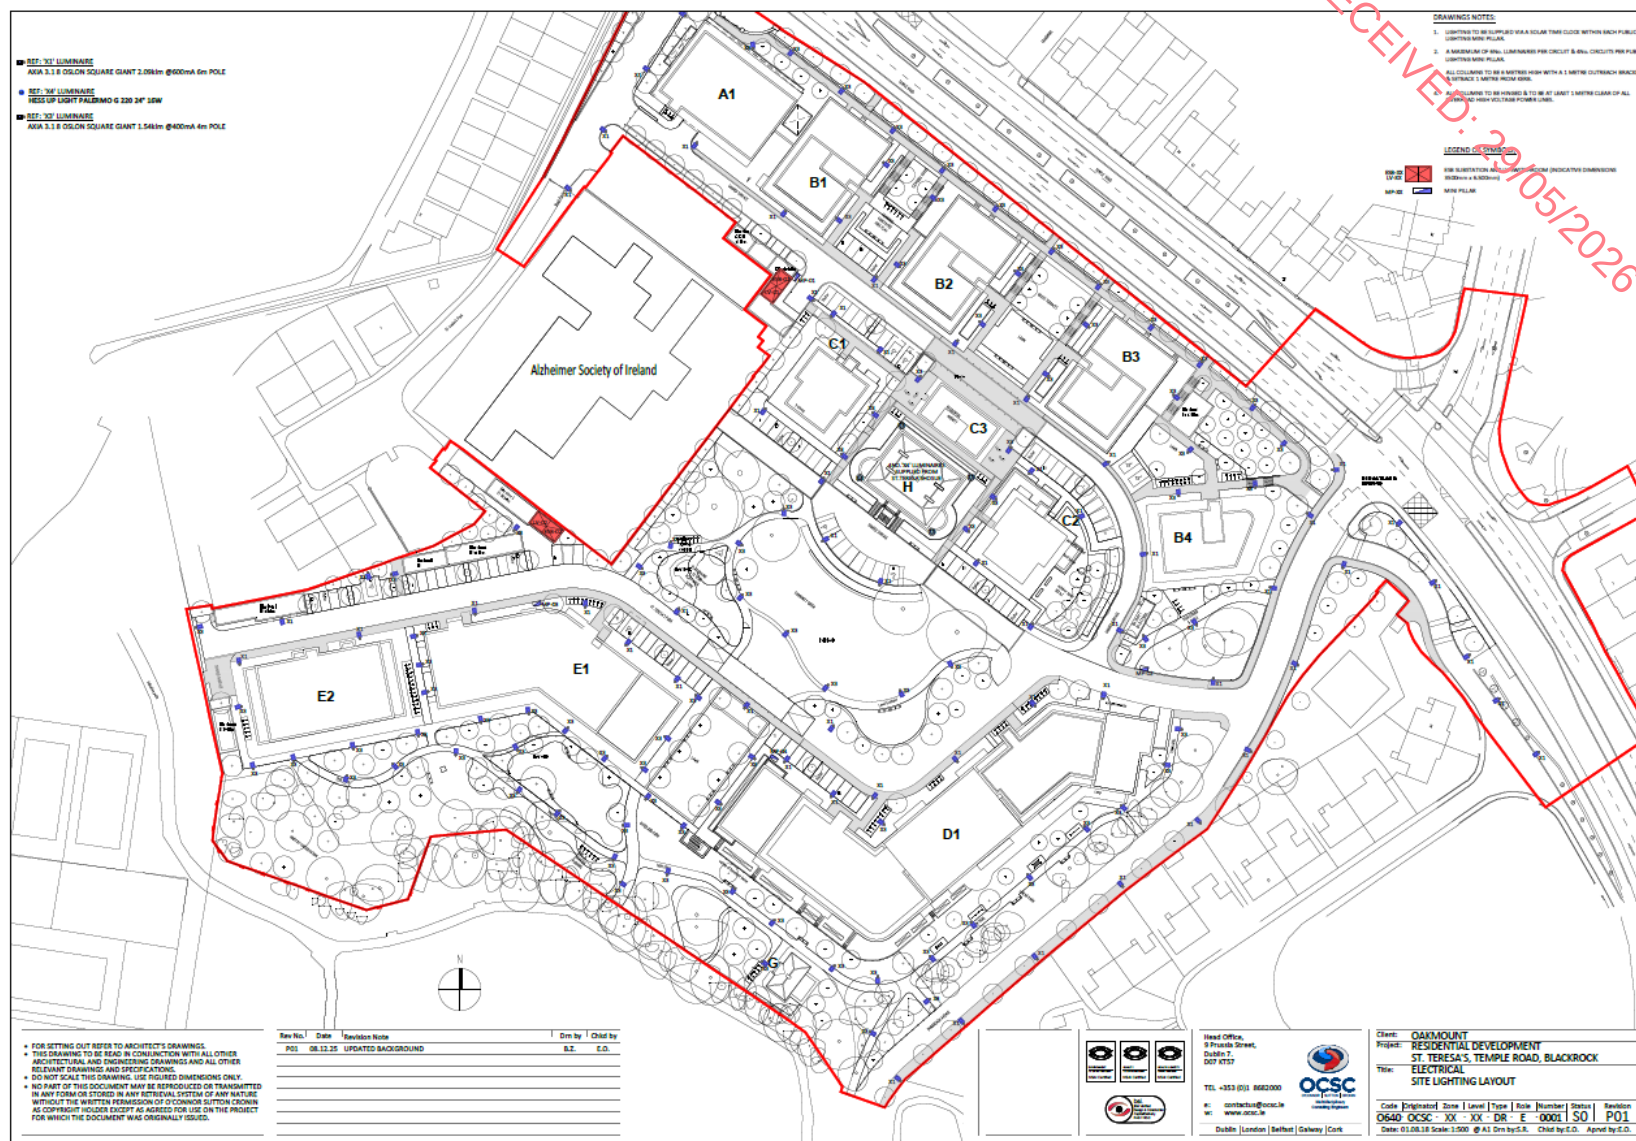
Proposed Site Lighting Layout at St. Teresa's (OCSC, 2025).
